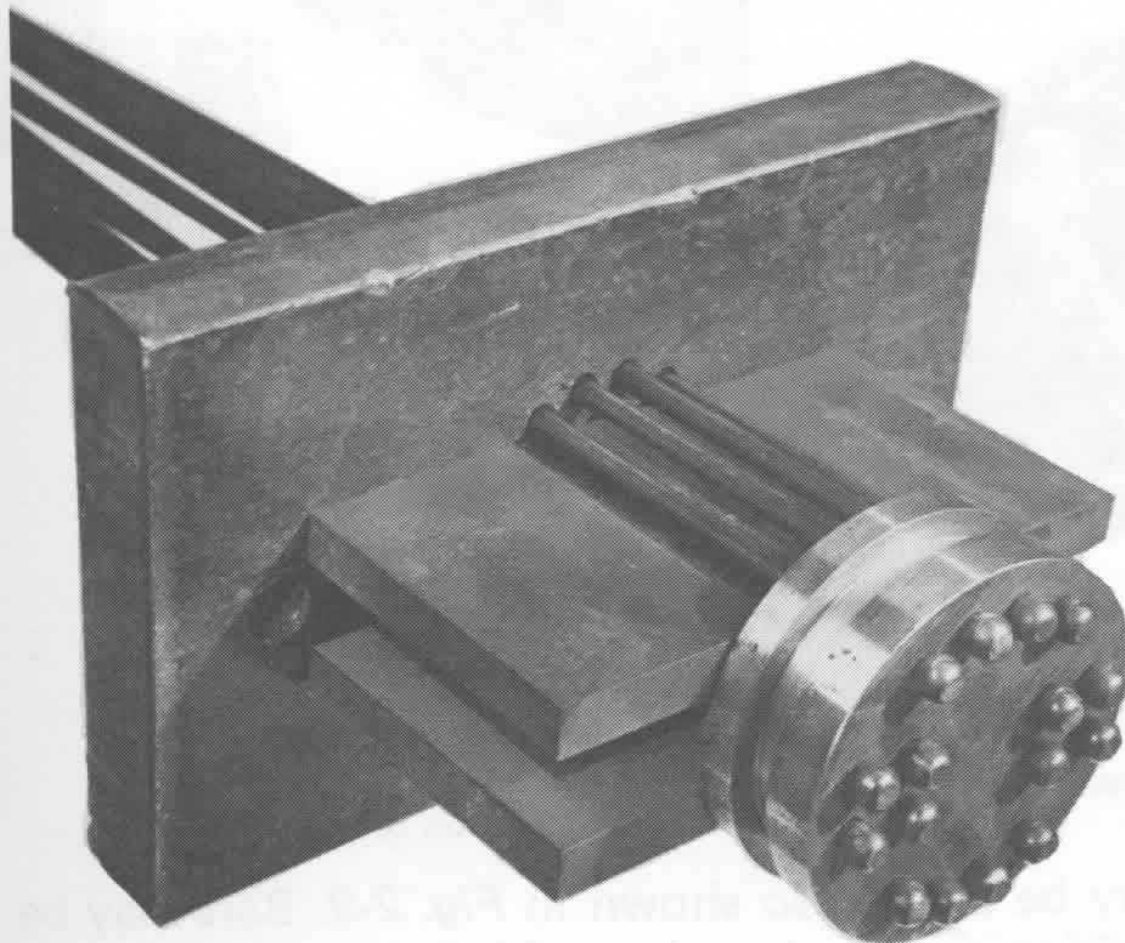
Button-head anchorage, stressing end, non-grouted
